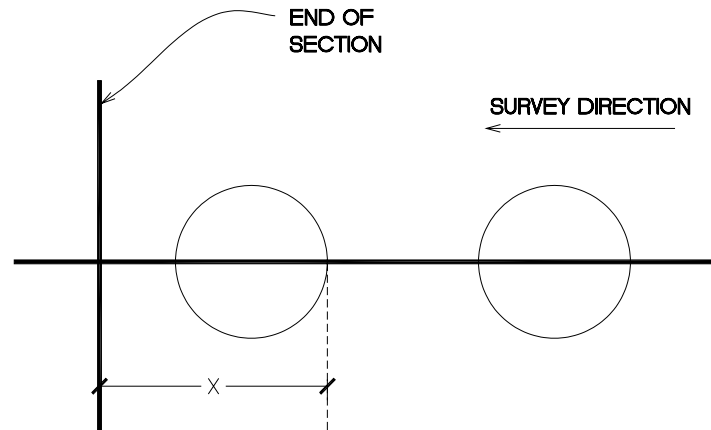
Back end of the front footpad is before the end of the test section when last reading is obtained.
